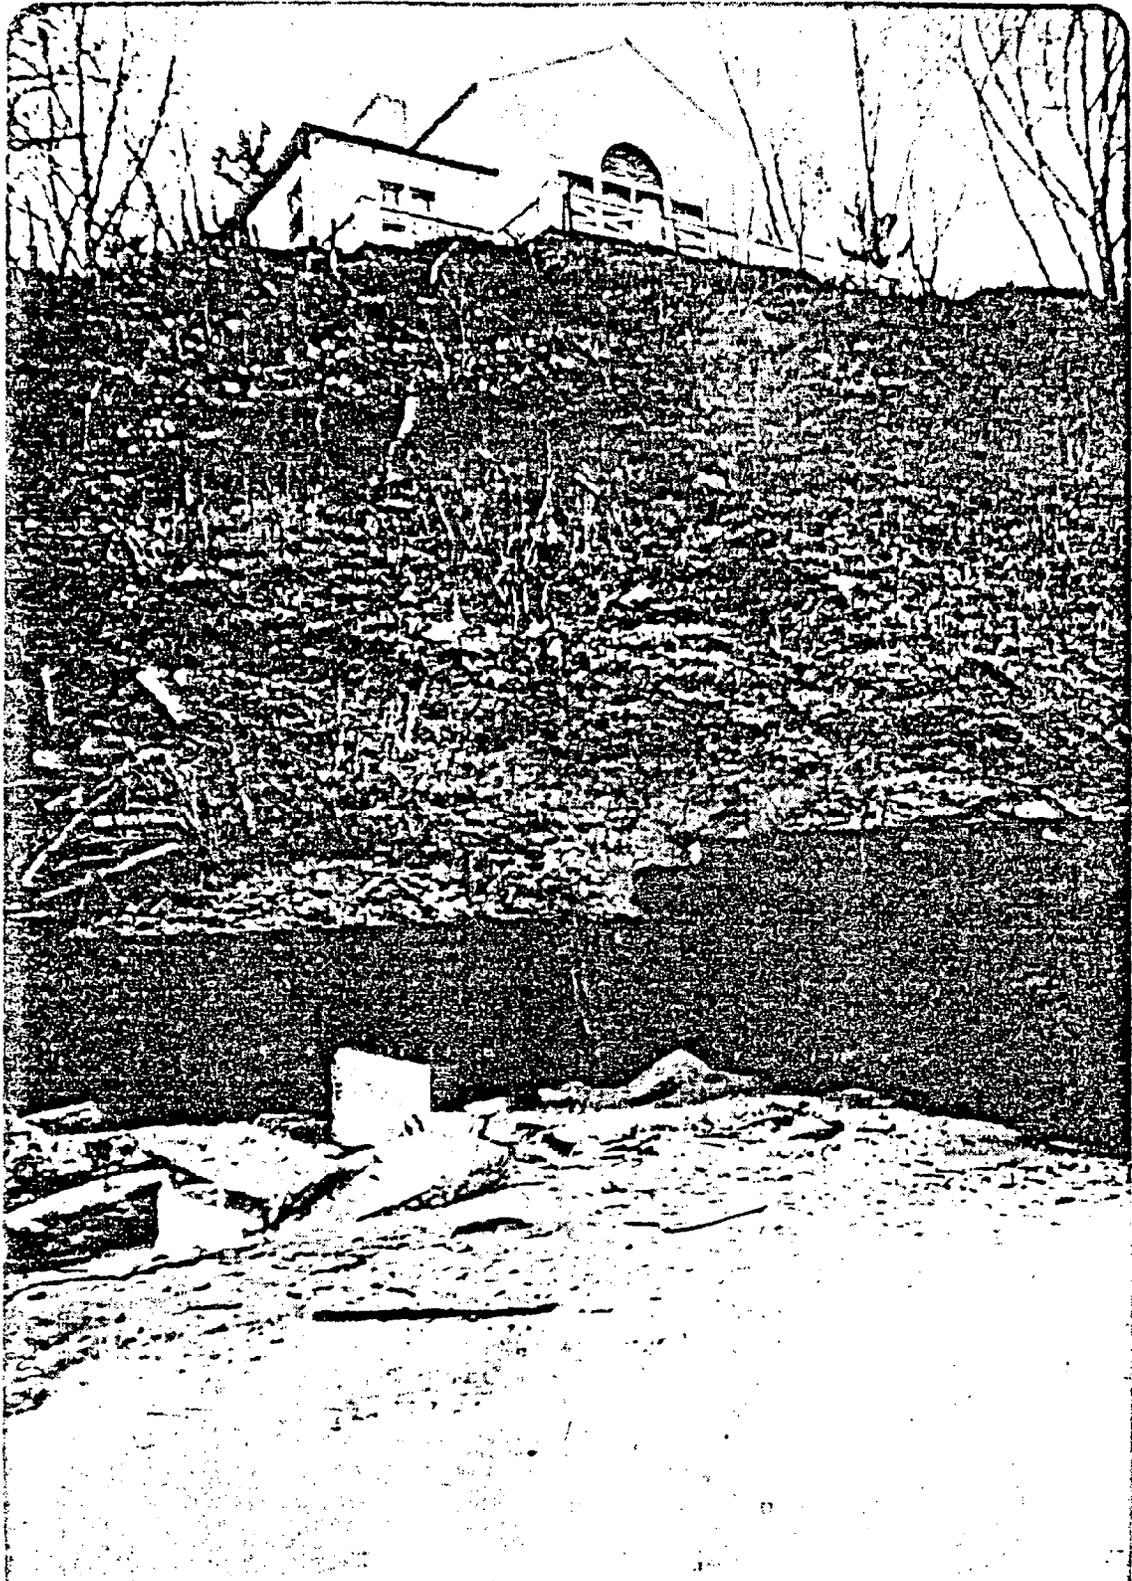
Steel seawall shoreline protection structure, protecting home which is in danger of toppling over bluff. Photograph taken in May, 1979.
